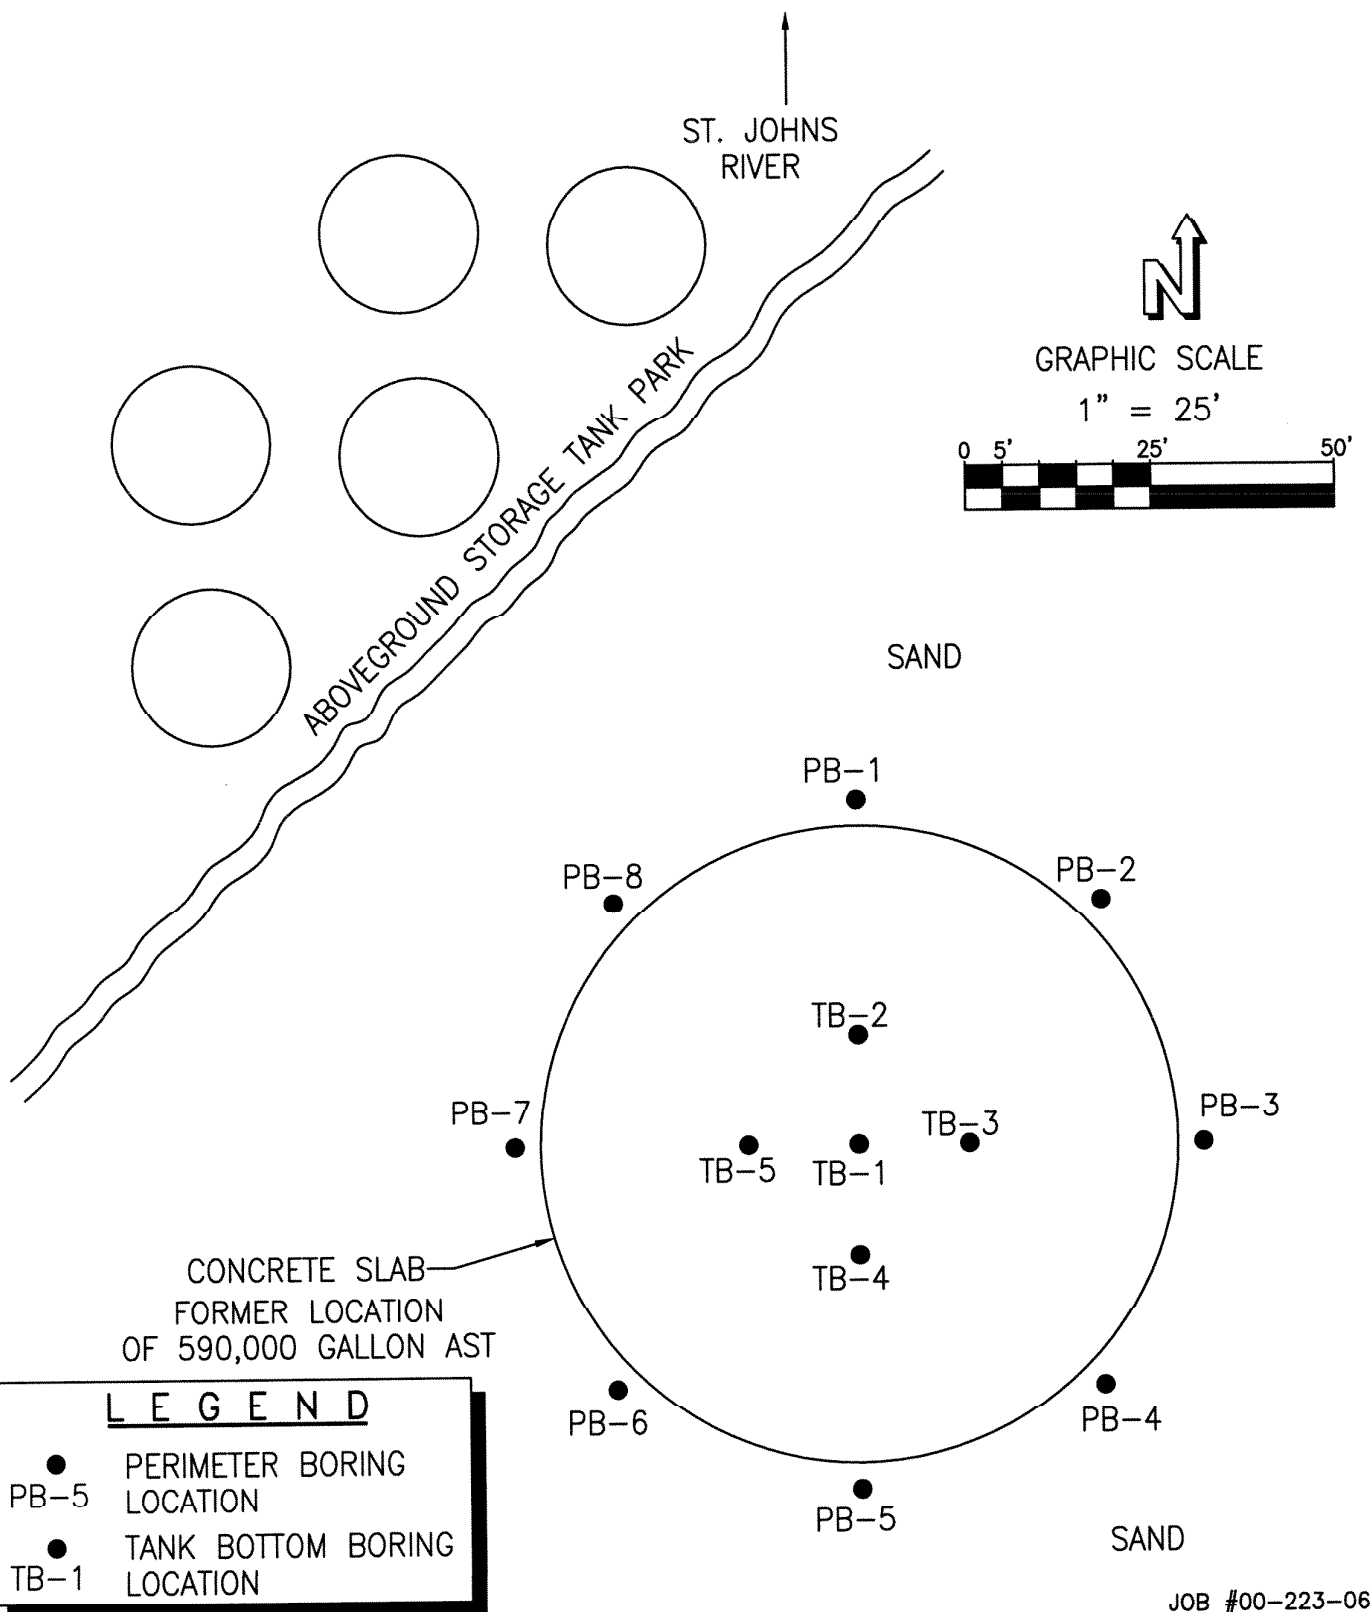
SITE PLAN AND SAMPLING LOCATIONS
